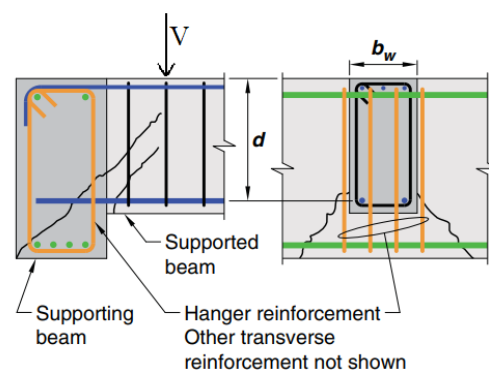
Diagram of the support beam reinforcement in the junction zone with the supported beam [5]
